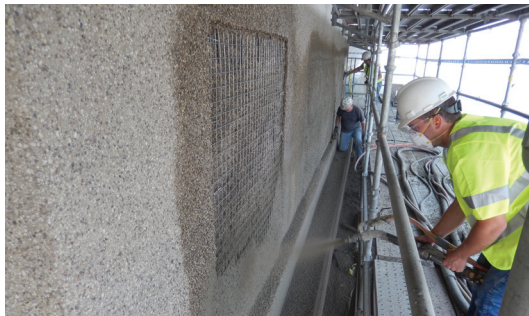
Localized exterior wall repair using wet-process shotcrete
